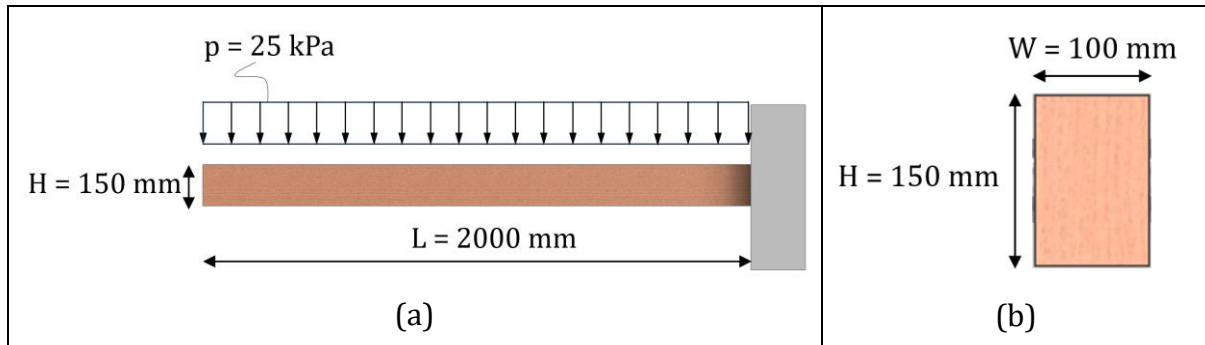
A cantilever beam representing a simplified version of the structural system.
